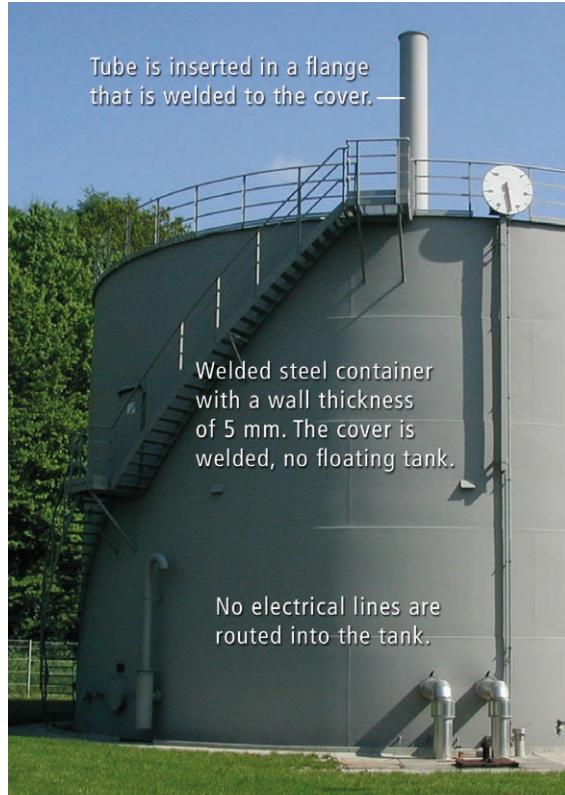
Welded steel container (source: Eisenbau Heilbronn GmbH)
